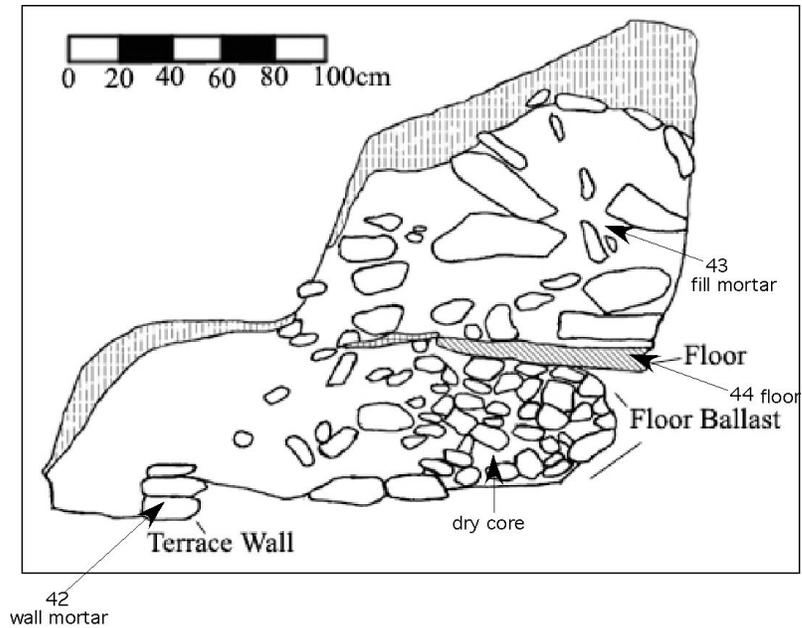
LT 13, Str. 1A-1b-II. East wall.
